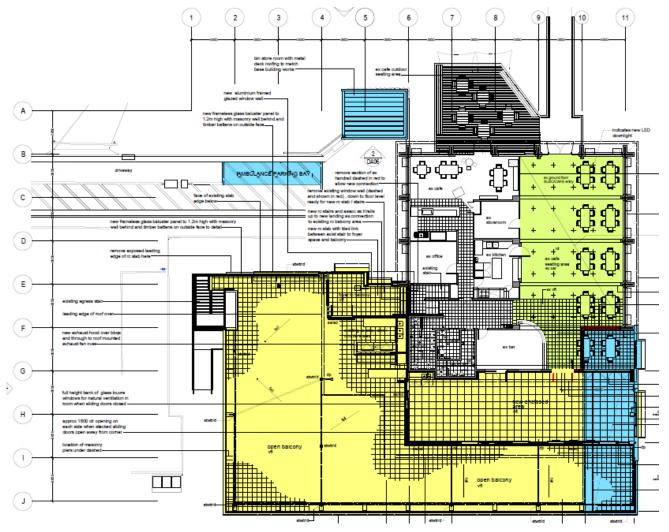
Proposed First Floor (Northern Beaches Council, September 2023)
